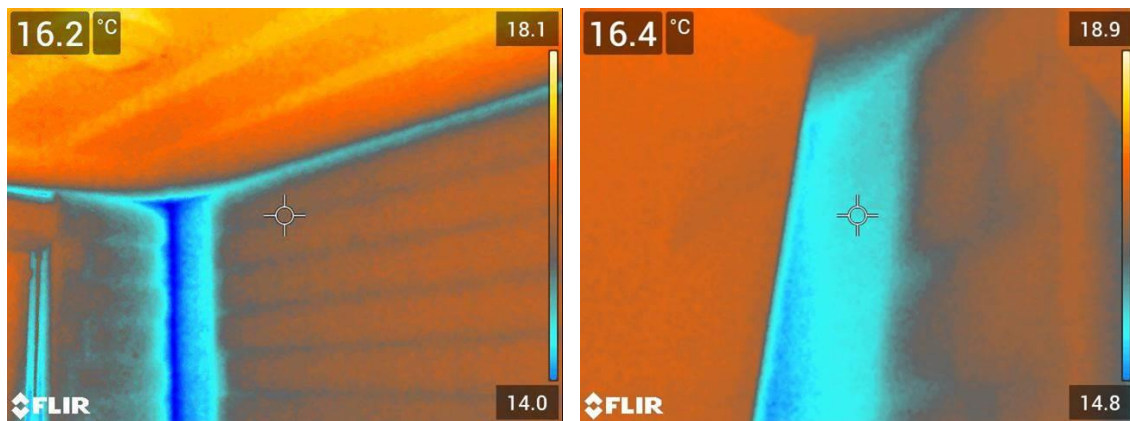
Upper ground floor plan, apartment A, room 5. Thermographic images T2575 e T2639.
